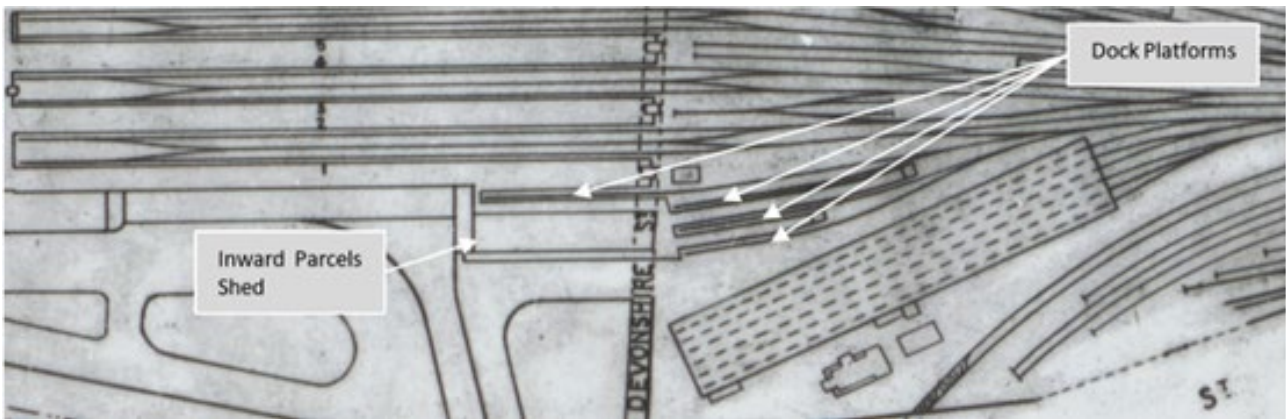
Excerpt from 1922 plan of Central Station, showing the locations of the dock platforms and Inward Parcels Shed.
